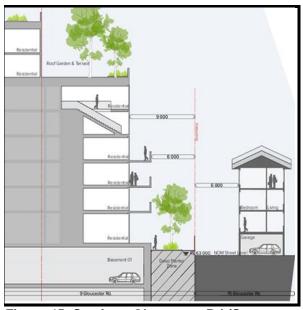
Section - Gloucester Rd (Source: Fig 4 Section 8.3 of HDCP 2)
